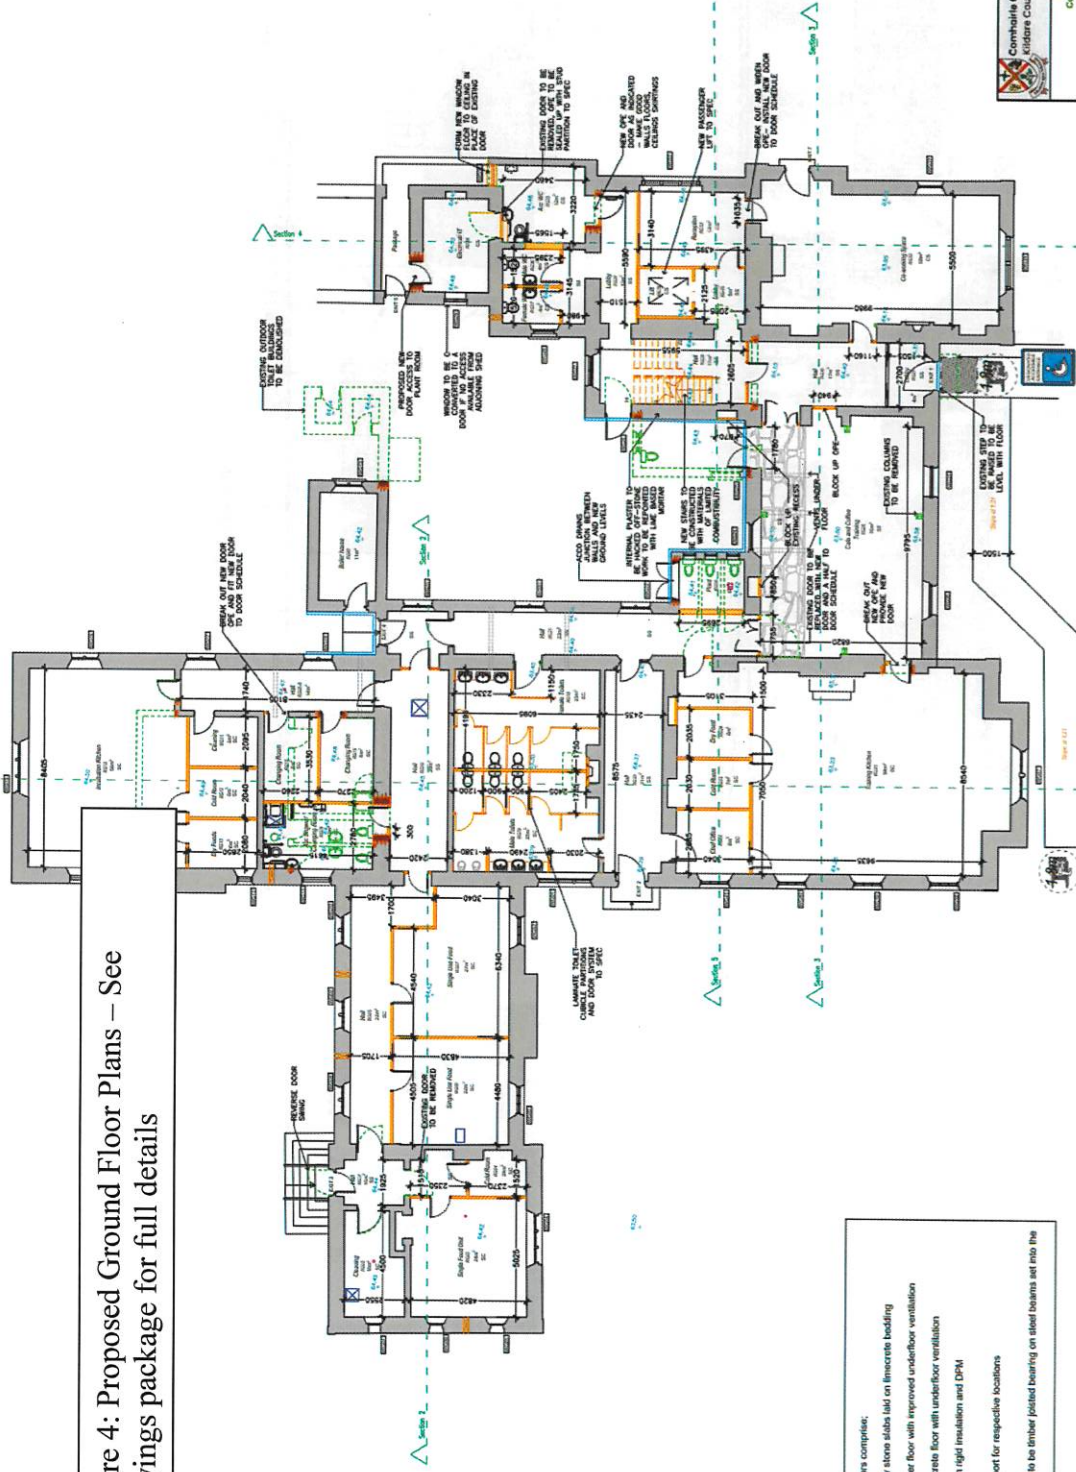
Proposed Ground Floor Plans – See drawings package for full details
